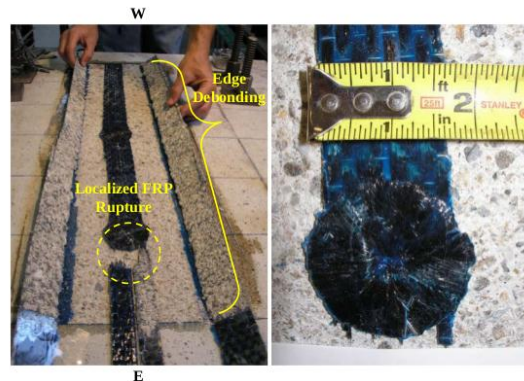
Failure of the specimen with two anchors placed longitudinally [27]
